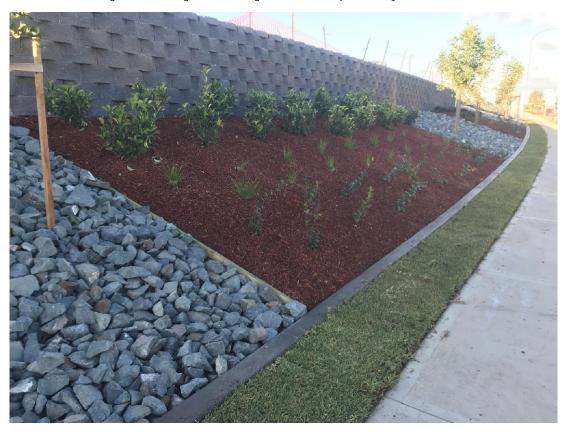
Example of retaining wall in location of fill adjacent to road reserve
